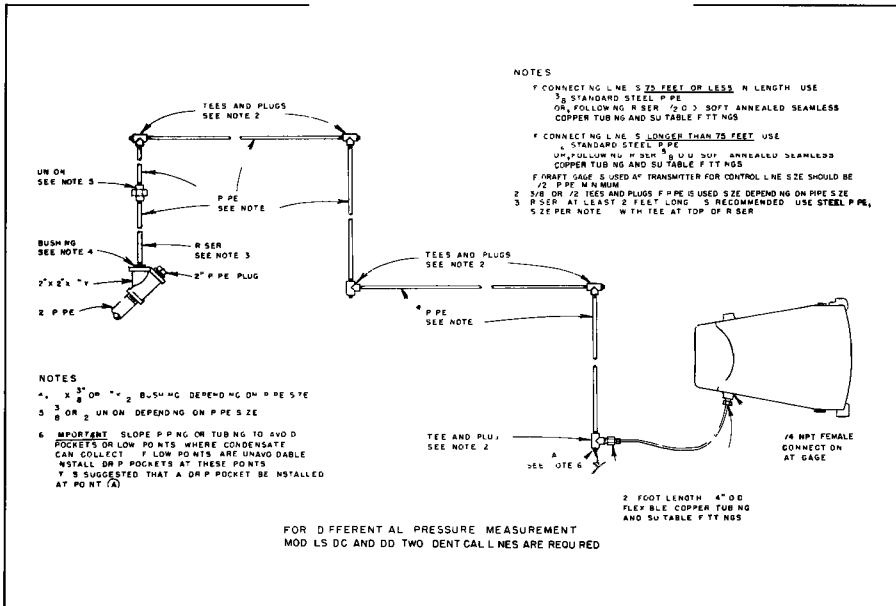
Recommended Connecting Piping Arrangement for Diaphragm Mechanism Mode. □
